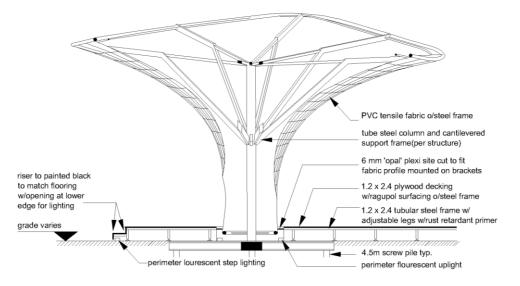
Detail Section of the 2007 Serpentine Pavilion. Source: Section scheme is produced by the author.
